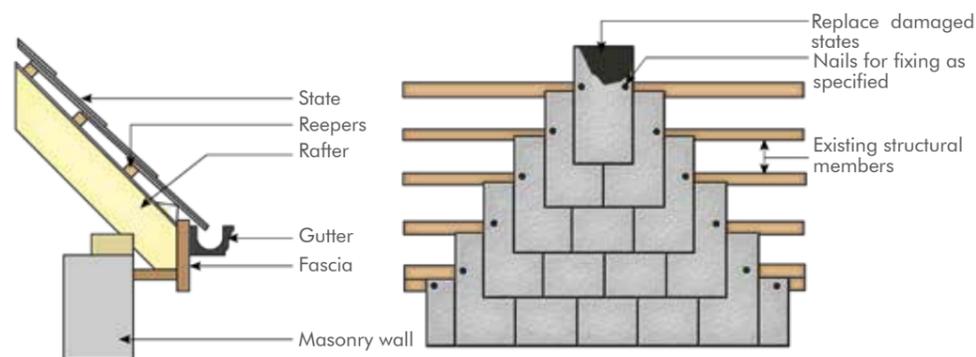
Detail of slate roofing, Source: Modified from IS: 51196(part-1)-1968
